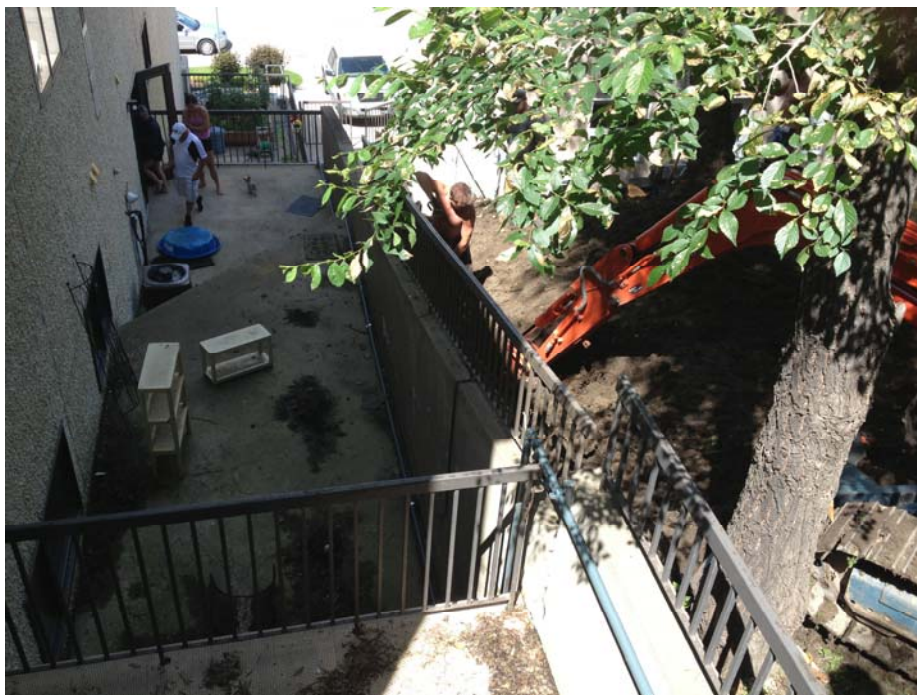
Looking Northeast at Trench being Excavated Adjacent to Wall between 230 & 306 Sask. Cres. E. (July 7, 2013)
